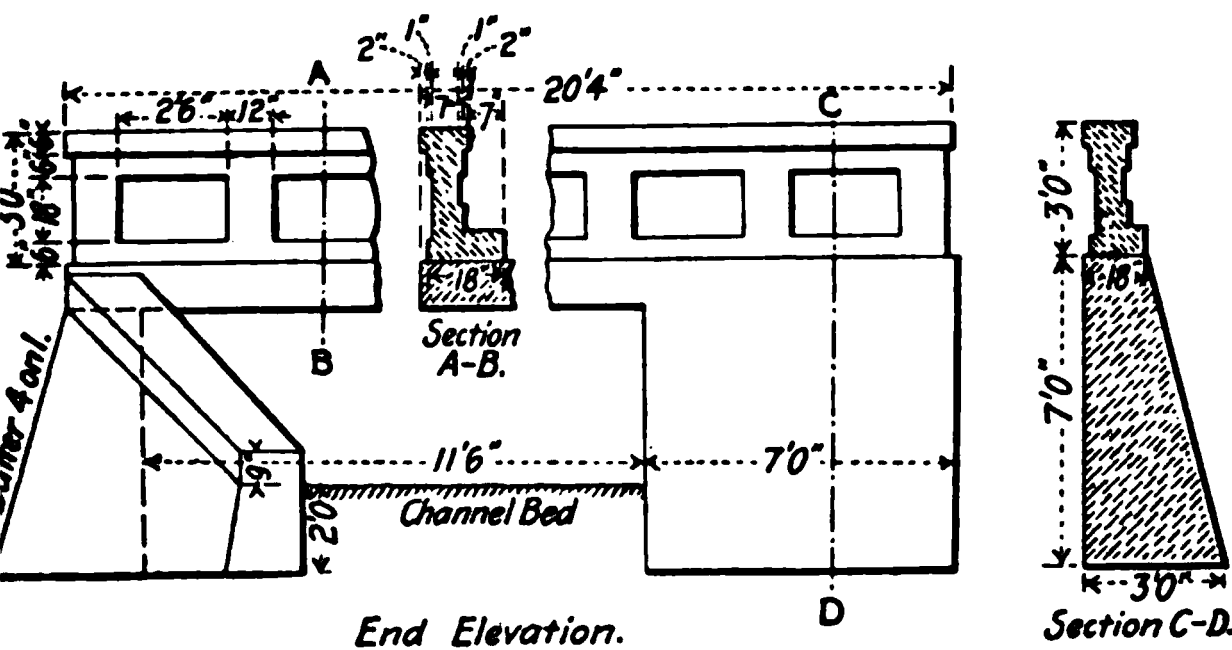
Showing Raised Parapet on Skew Bridge extended over
